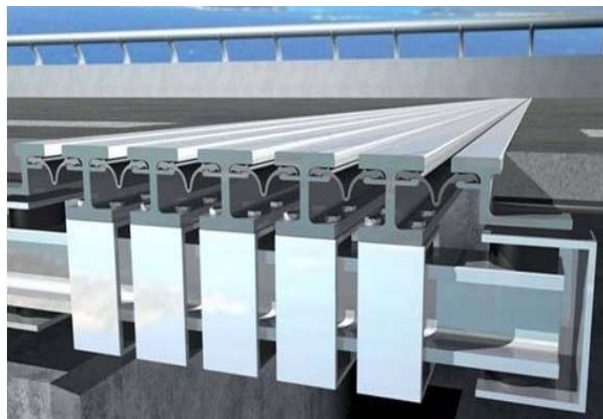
A Tensa-Modular expansion joint (cross section at a support bar), showing stirrup connections to centerbeams
